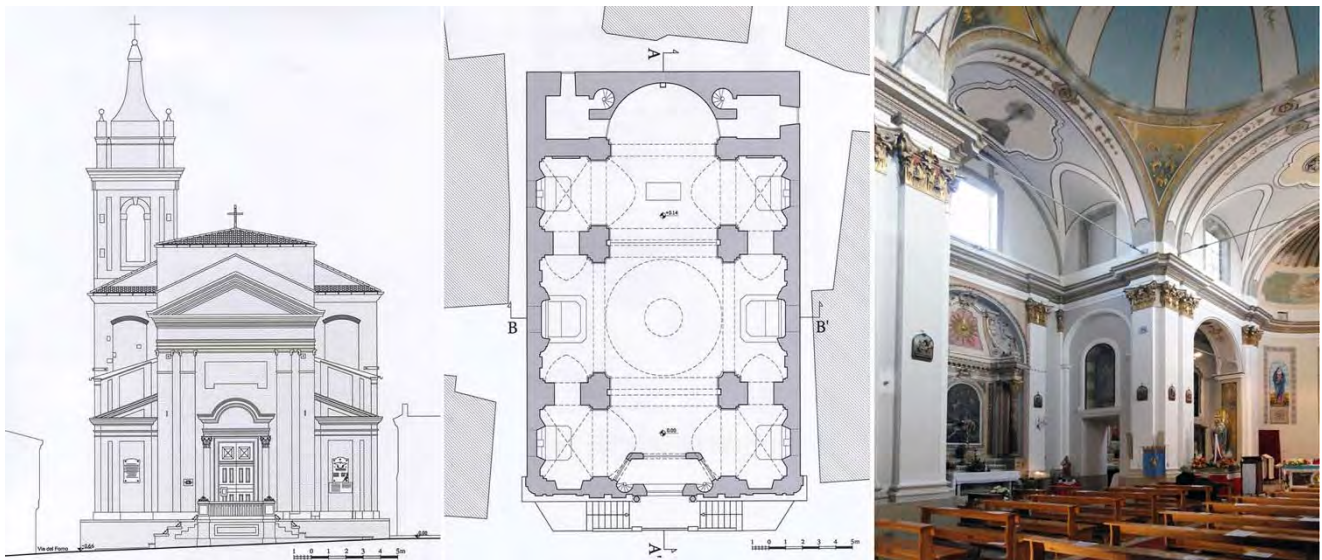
Survey of the Church of Santa Maria del Soccorso: elevation and plan, internal view – Source: elaboration of P. Tunzi
